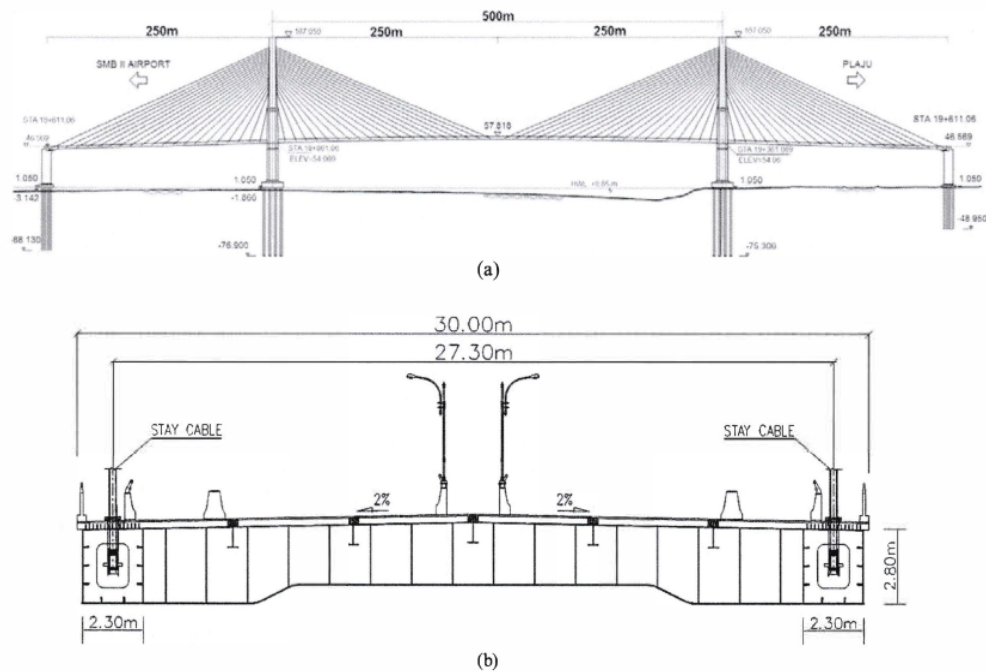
Prototype of Musi III Bridge. (a) longitudinal section, (b) cross section
